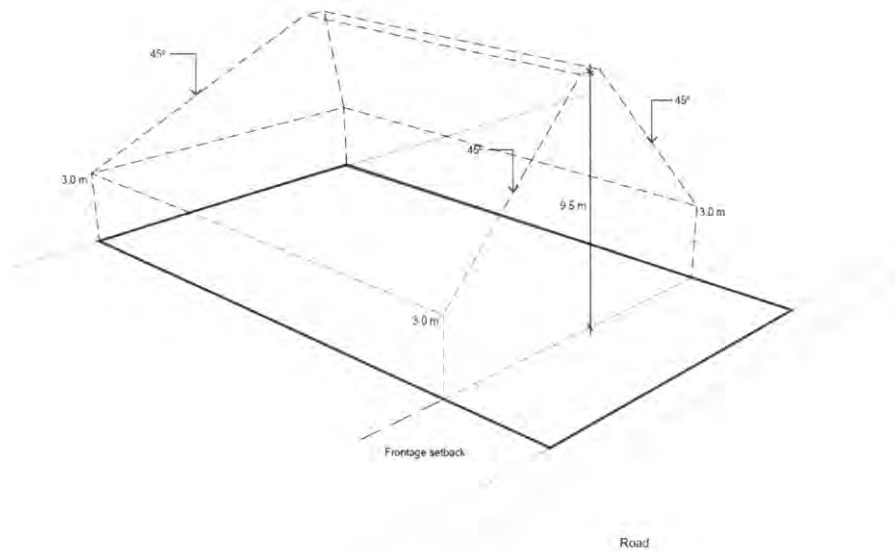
Building envelope as required by clause 9.4.2 A3(a) and clause 9.5.1 A2(a)
